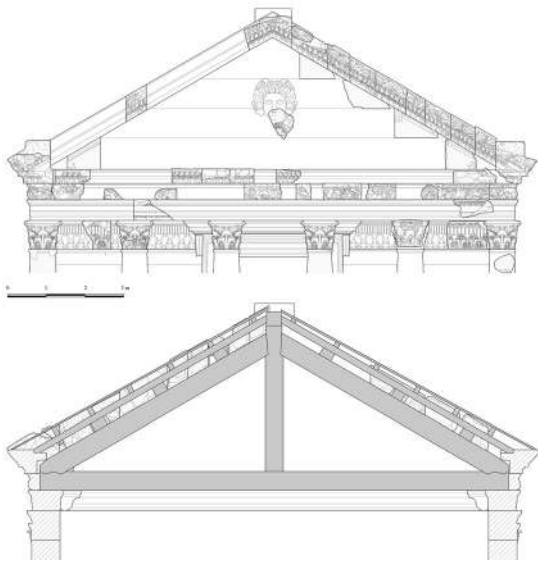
Hierapolis, Temple A, pediment of the façade (top) and section of the cella with the truss roof system (bottom) (scale 1 : 200)
